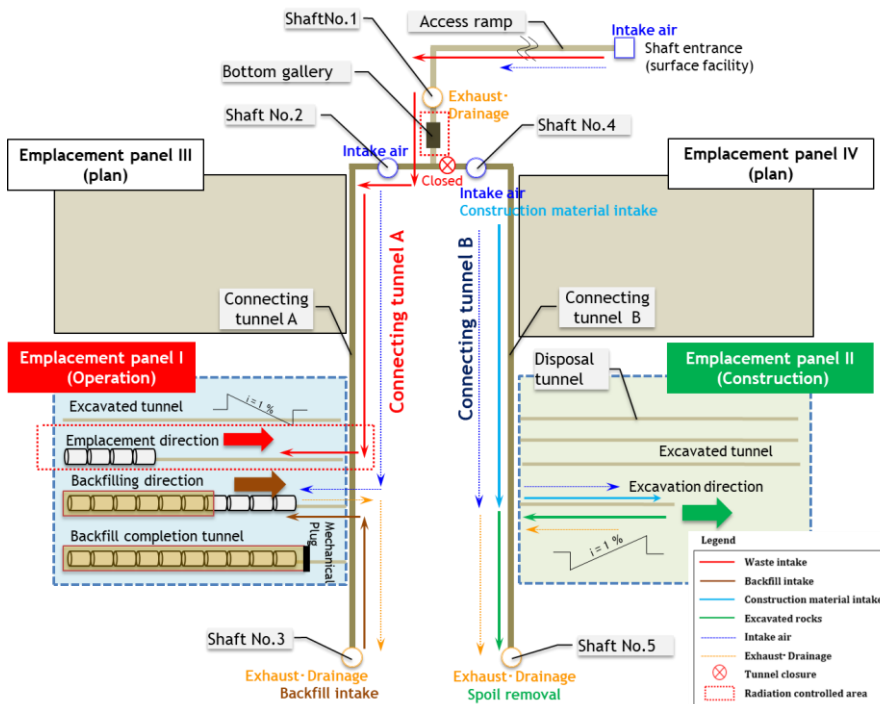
Conceptual sketch of tunnel layout (HLW DET panels)
